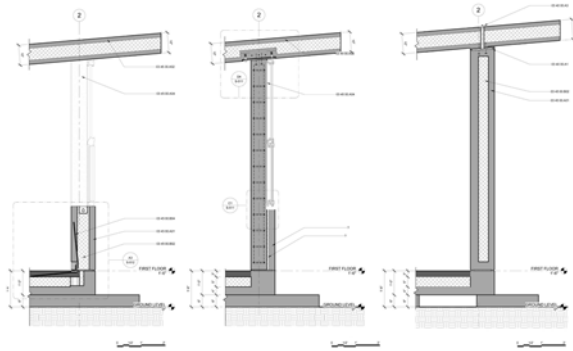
Wall Sections of the eNJoy! House showing floor, wall and roof panels.
